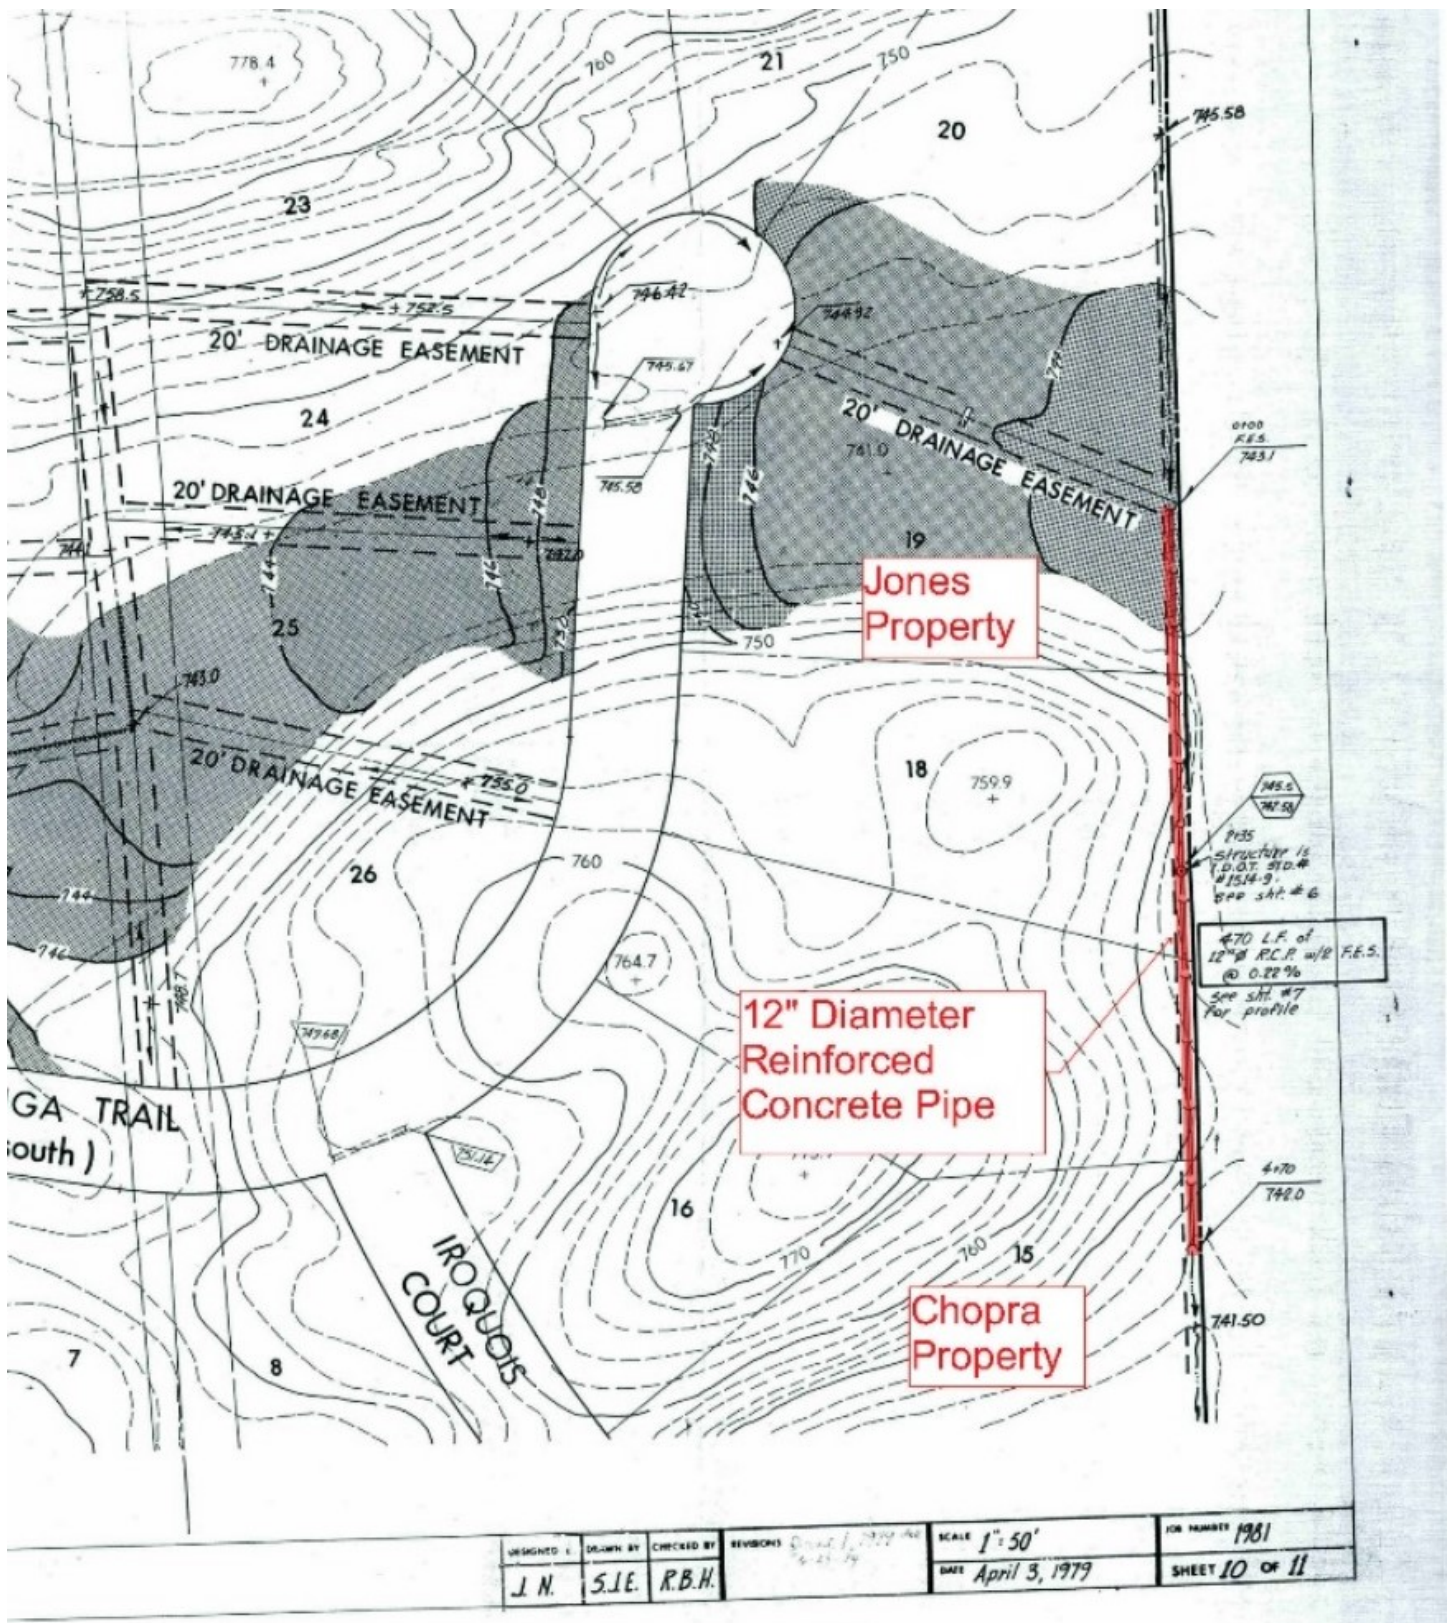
Exhibit A: Excerpt from Farm Trails Subdivision Plans / 12" pipe on east side
